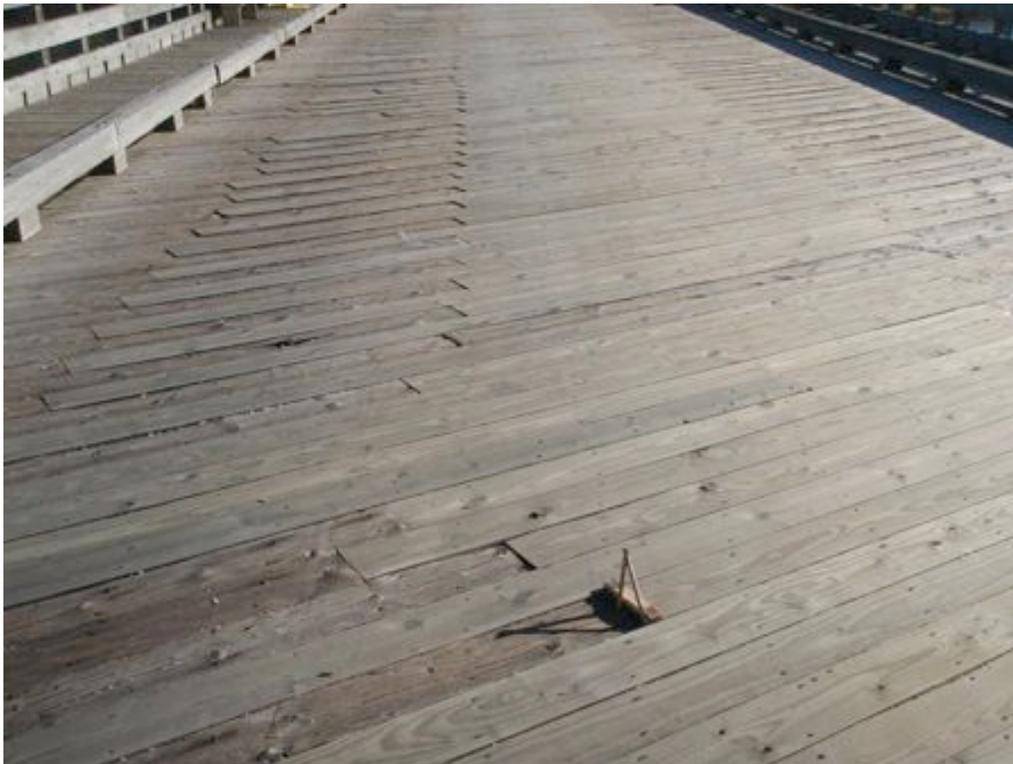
Typical uneven wearing surface planks (spans 1-7, looking east shown).
